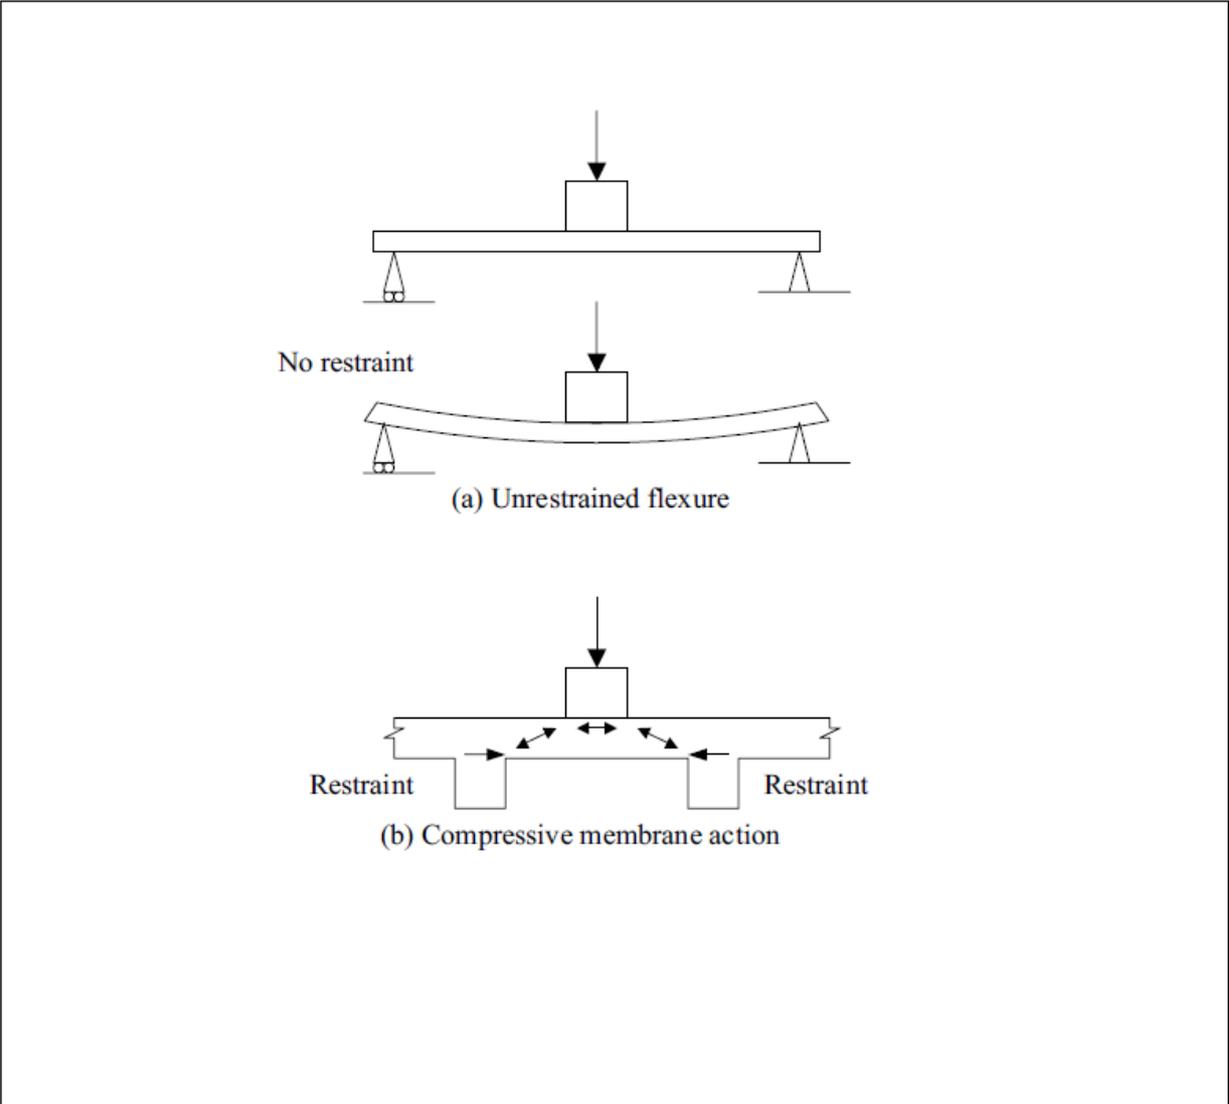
Structural Behaviour of Unrestrained and Restrained Slabs
